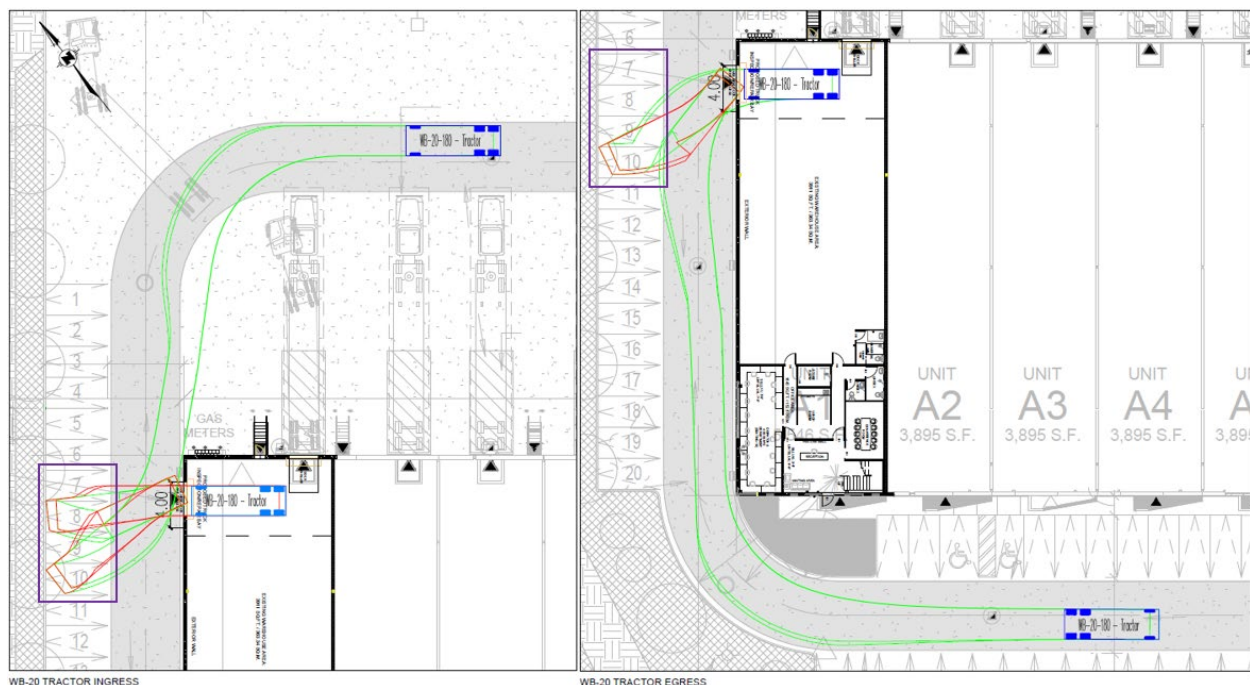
WB-20 Ingress and Egress at Proposed Truck Inspection/Repair Bay
